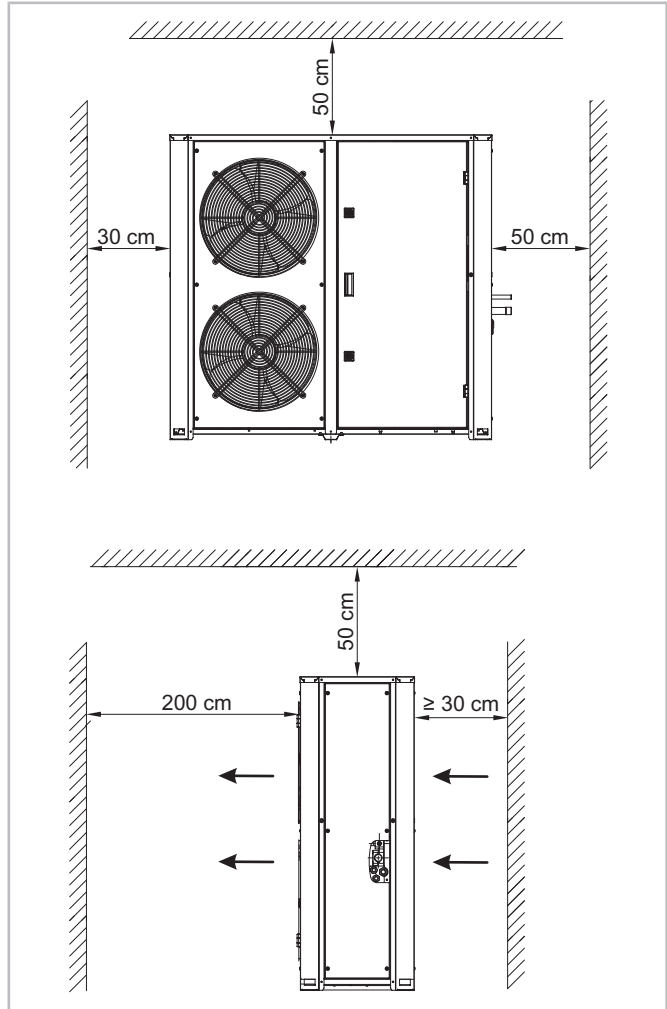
Minimum distances to the wall and ceiling (example shows LHL5E/ ..)
